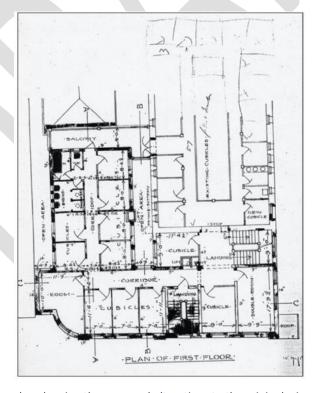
1925 First Floor plan showing the proposed alterations to the original wing, including the addition of a new cubicle in the southern corner (made possible by the removal of the original accessstair and floor infill) and the northern wing addition featuring open balconyat the eastern end (top left). (Source: City of Sydney Archives, 0540/25)
